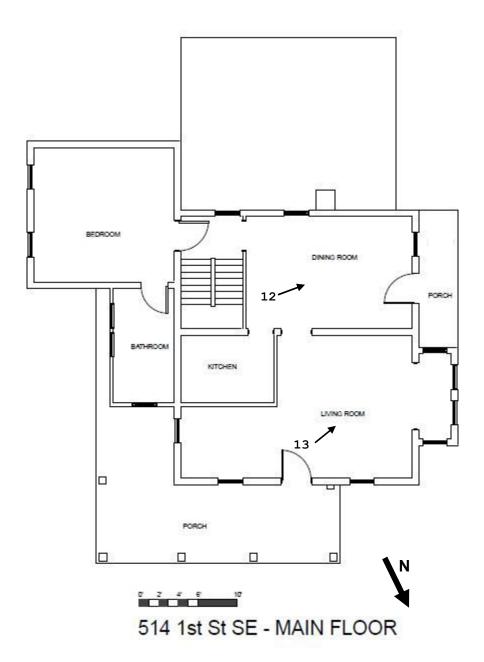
Main Floor Plan and showing directions of photographs #12-13
